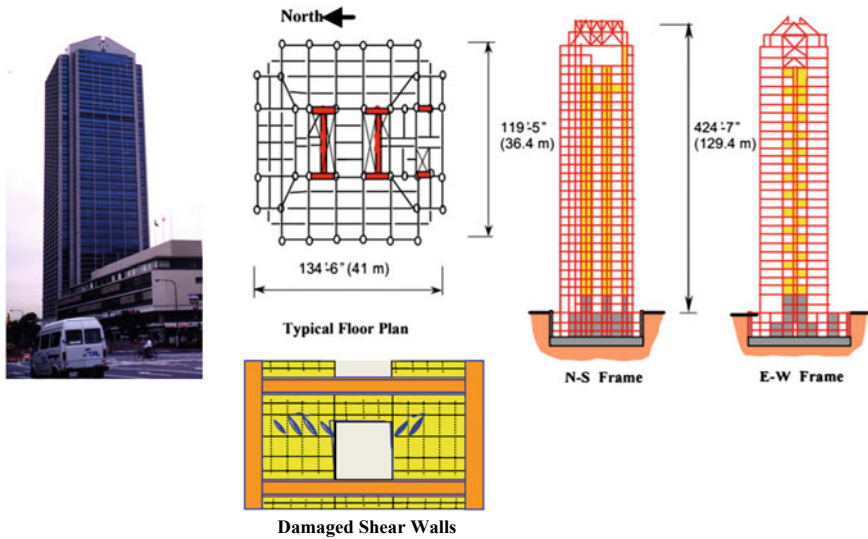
The 38-story steel shear wall building and damage during the 1995 Kobe earthquake (Astaneh-Asl and Zhao 2000)
